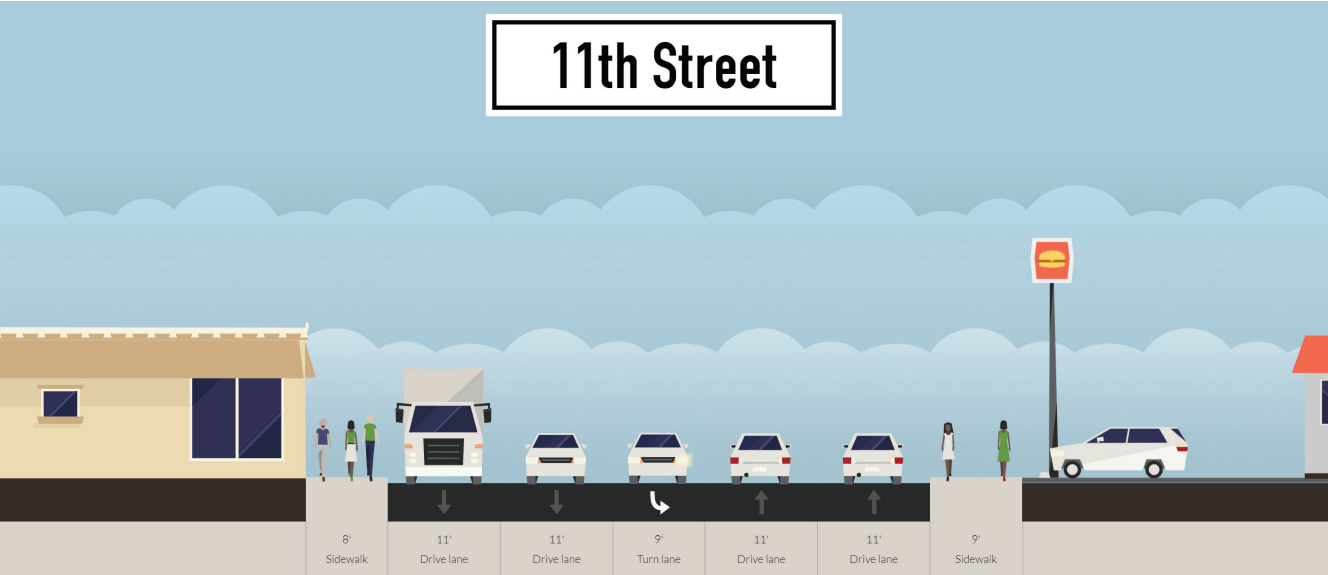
11th Street Section Showing Mid-Block Improvements
